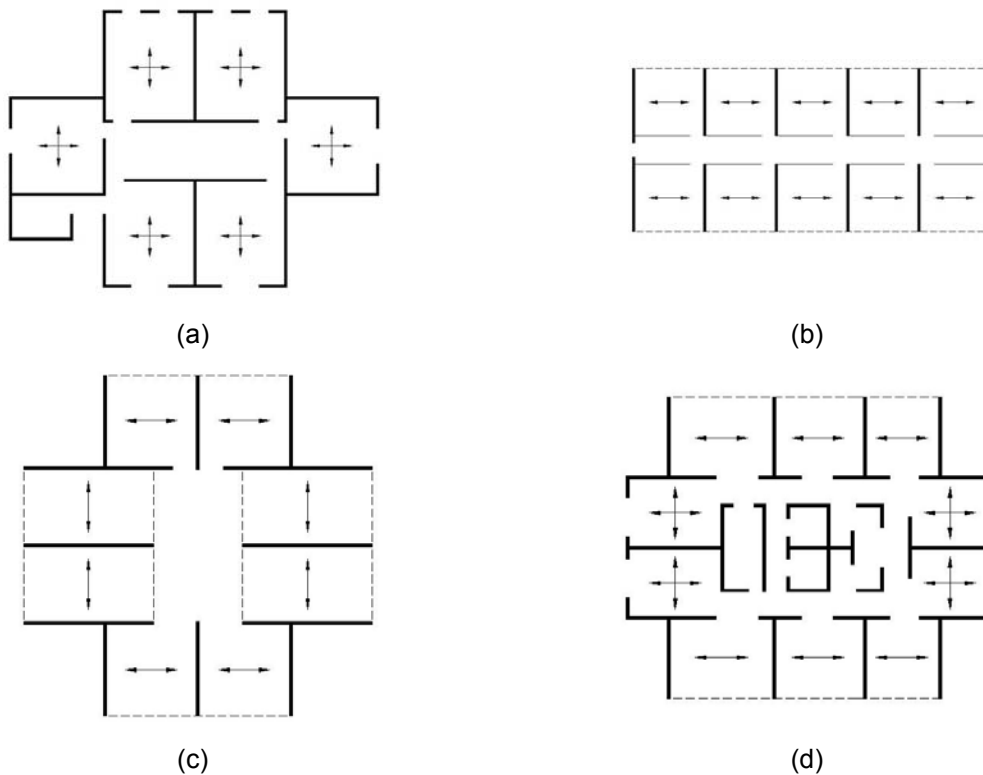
Possible layouts of resistant walls: (a) cellular, (b) simple cross-wall structure, (c) double cross-wall system and (d) core-wall structure.
